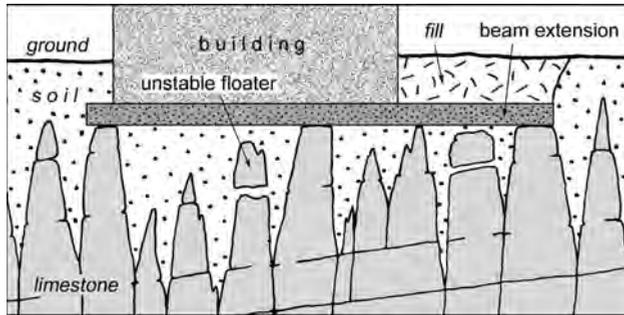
Foundation raft or ground beams with extensions to reach stable rock pinnacles in a deeply fissured limestone rockhead.
